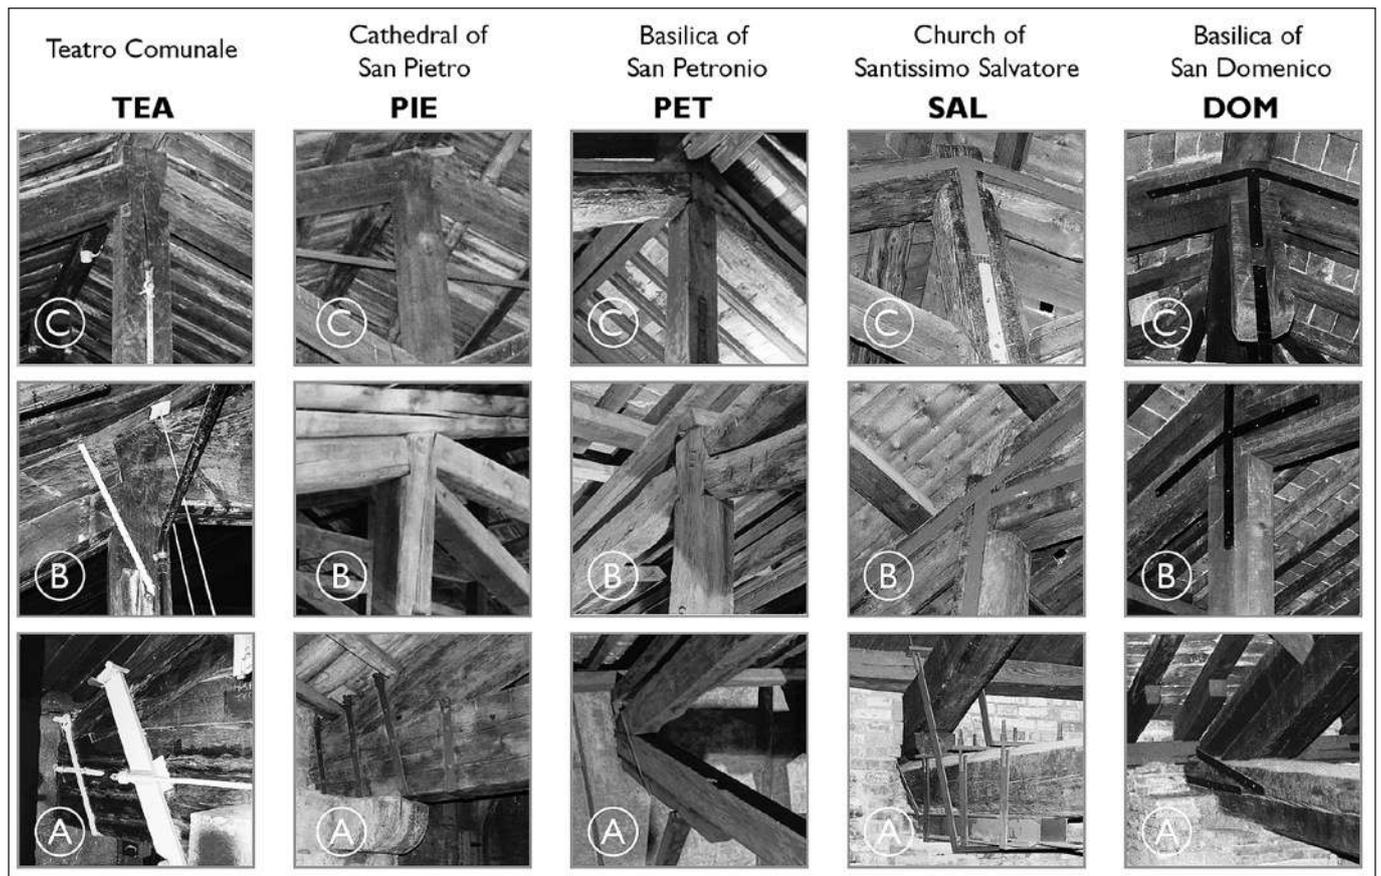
Pictures of the main structural joints of the analyzed R-trusses.
